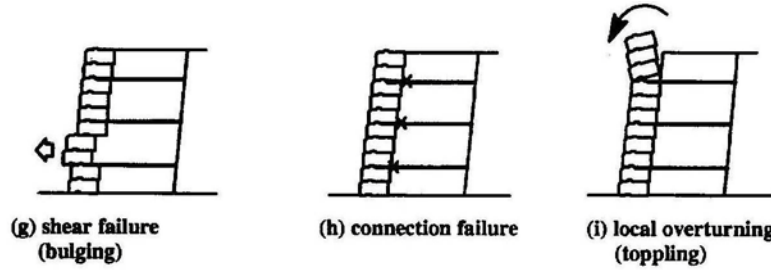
Potential Facing Modes of Failure: g) Shear Failure, h) Connection Failure, i) Local Overturning (Bathurst and Cai, 1995)
